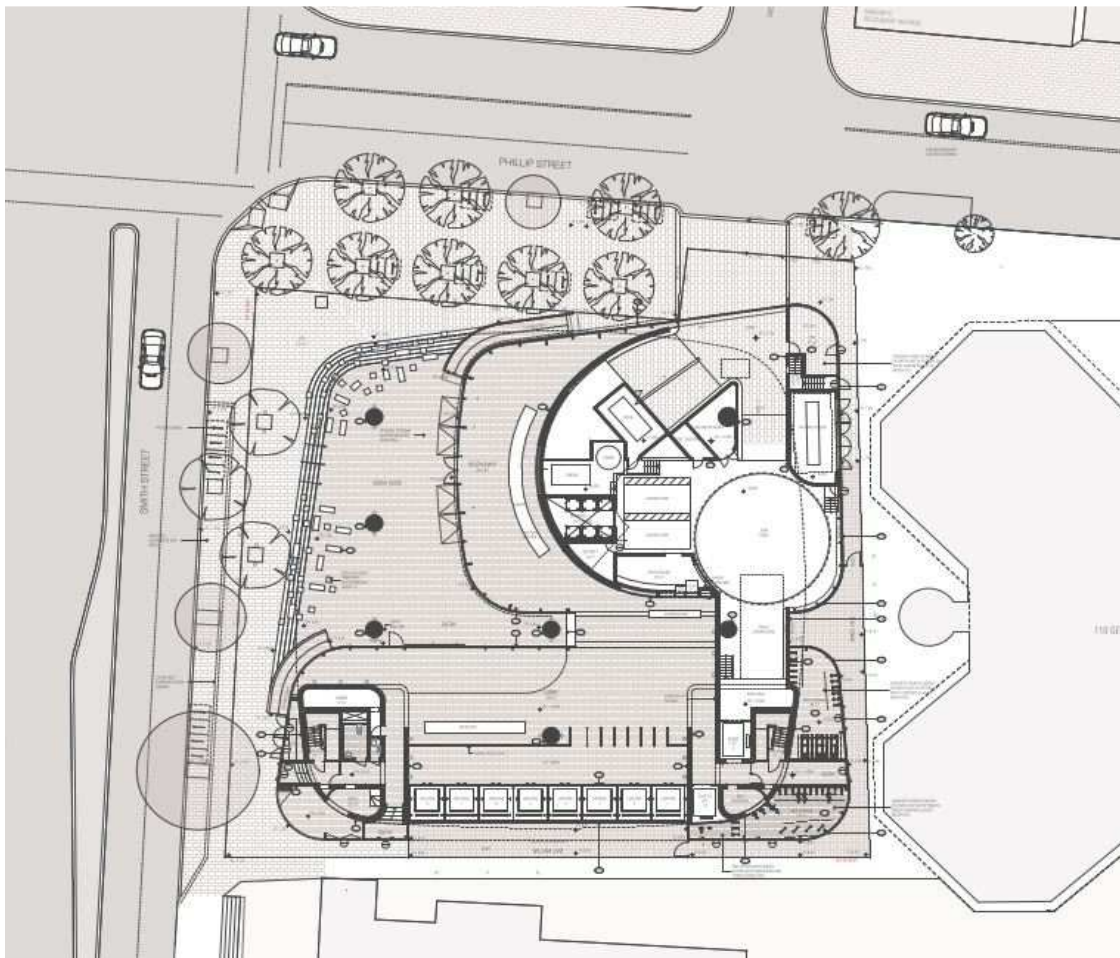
Proposed ground floor plan. (Source: Fender Katsalidis).
